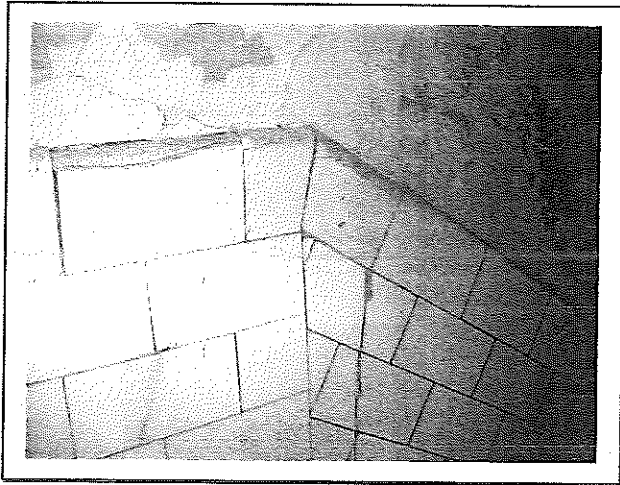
Viewing white ceramic wall, South entrance of Main building.
